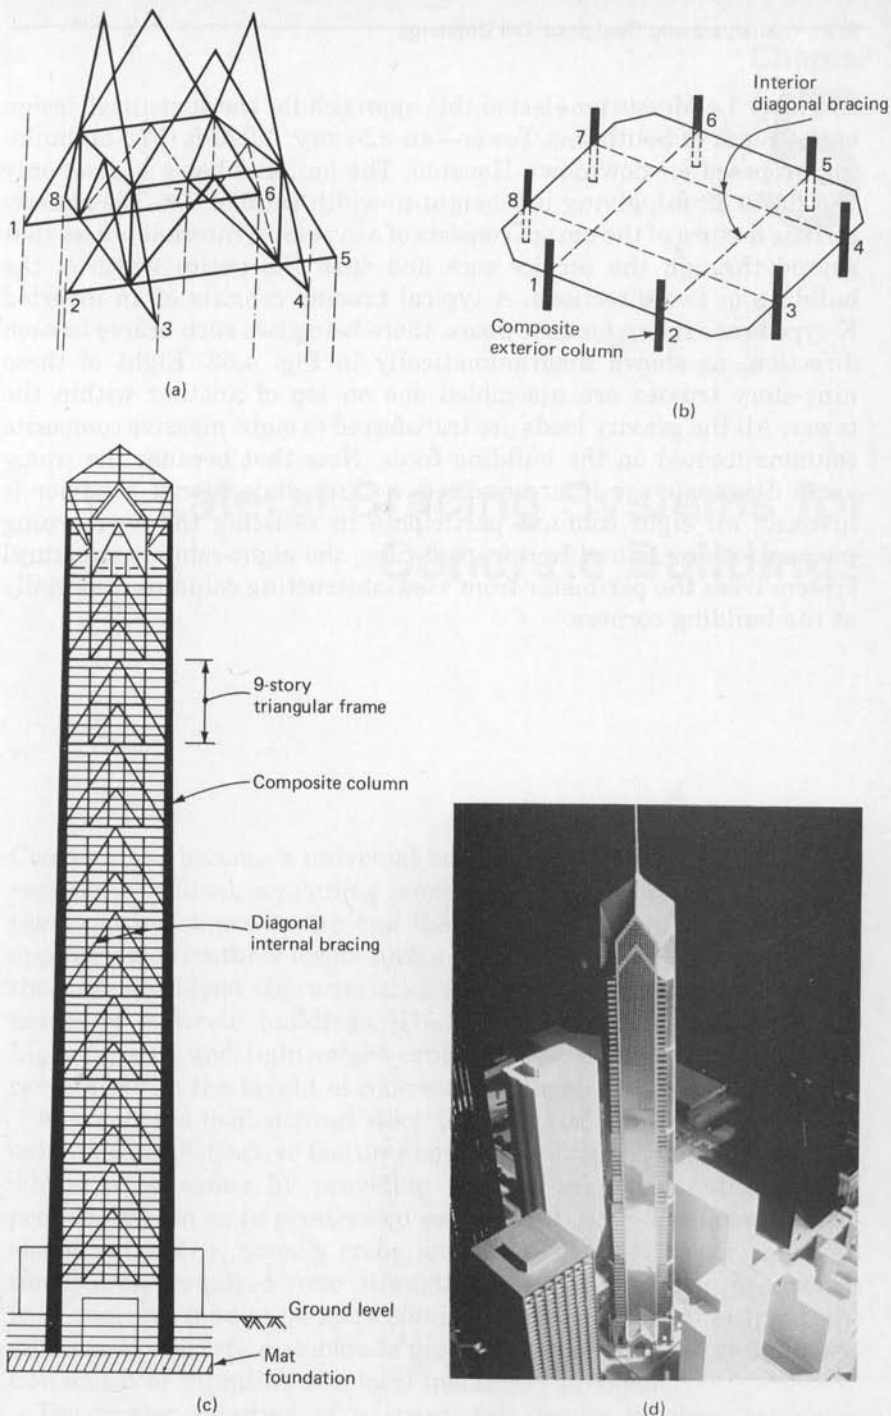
Bank of Southwest Tower (Structural engineers, Le Messurier Associates and Walter P. Moore Associates, architects Murphy/Jahn and Lloyd Jones and Fillpot). (a) Schematic representation of interior diagonal bracing; (b) schematic plan; (c) schematic section; (d) photograph of model. (Photo courtesy of Malcolm Stewart, Century Development Corporation.)
